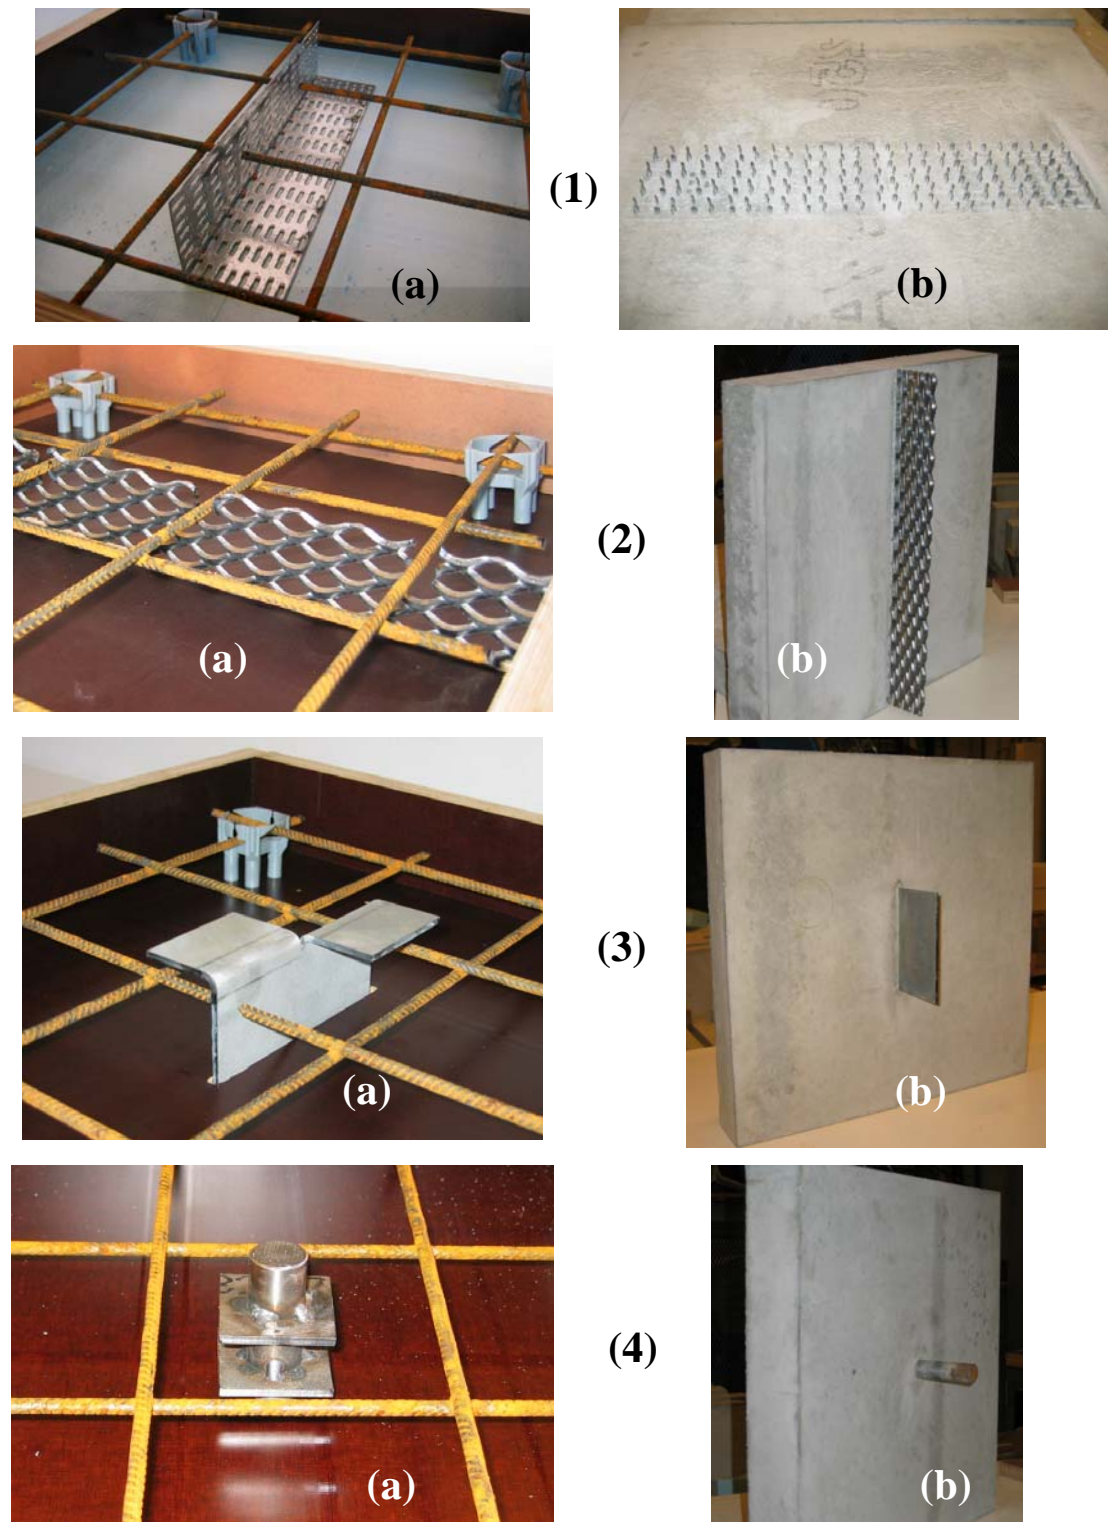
Connectors tested for a prefabricated timber-concrete composite floor in Sweden: (1) Toothed metal plate connector (type SNP): a) in moulding form, b) prefabricated slab with teeth of the plate protruding out ready to be pressed into glulam joist; (2) Epoxy-glued continuous steel mesh (SM): a) in the moulding form, b) prefabricated concrete slab with inserted shear connector; (3) Epoxy-glued folded steel plate (GSP): a) in the moulding form, b) prefabricated slab with inserted shear connector; (4) Epoxy-glued steel dowel with flanges (GDF): a) in the moulding form, b) prefabricated slab with inserted shear connector (Lukaszewska, 2009)
